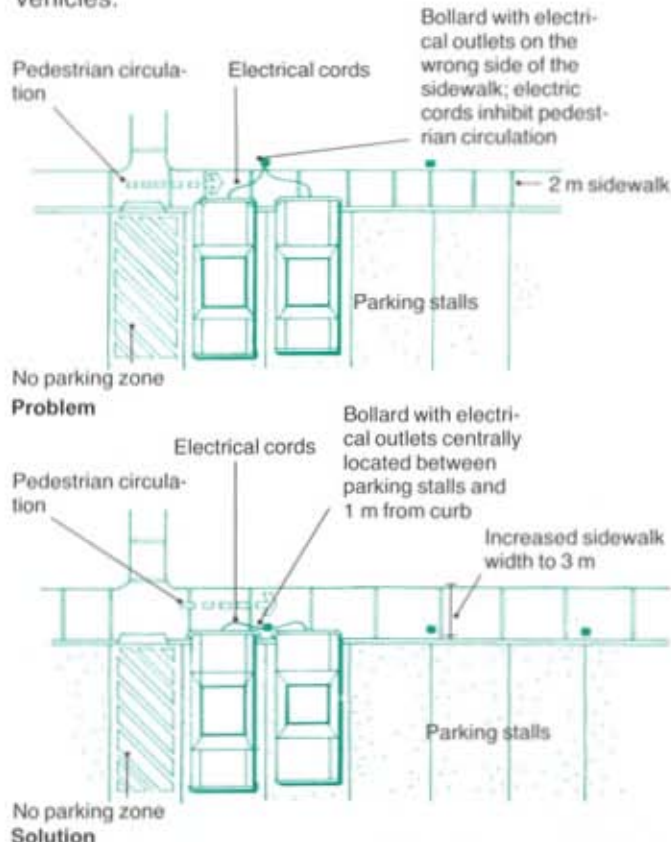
If they are not carefully placed, bollards with electrical outlets can interfere with pedestrians on the sidewalk.
